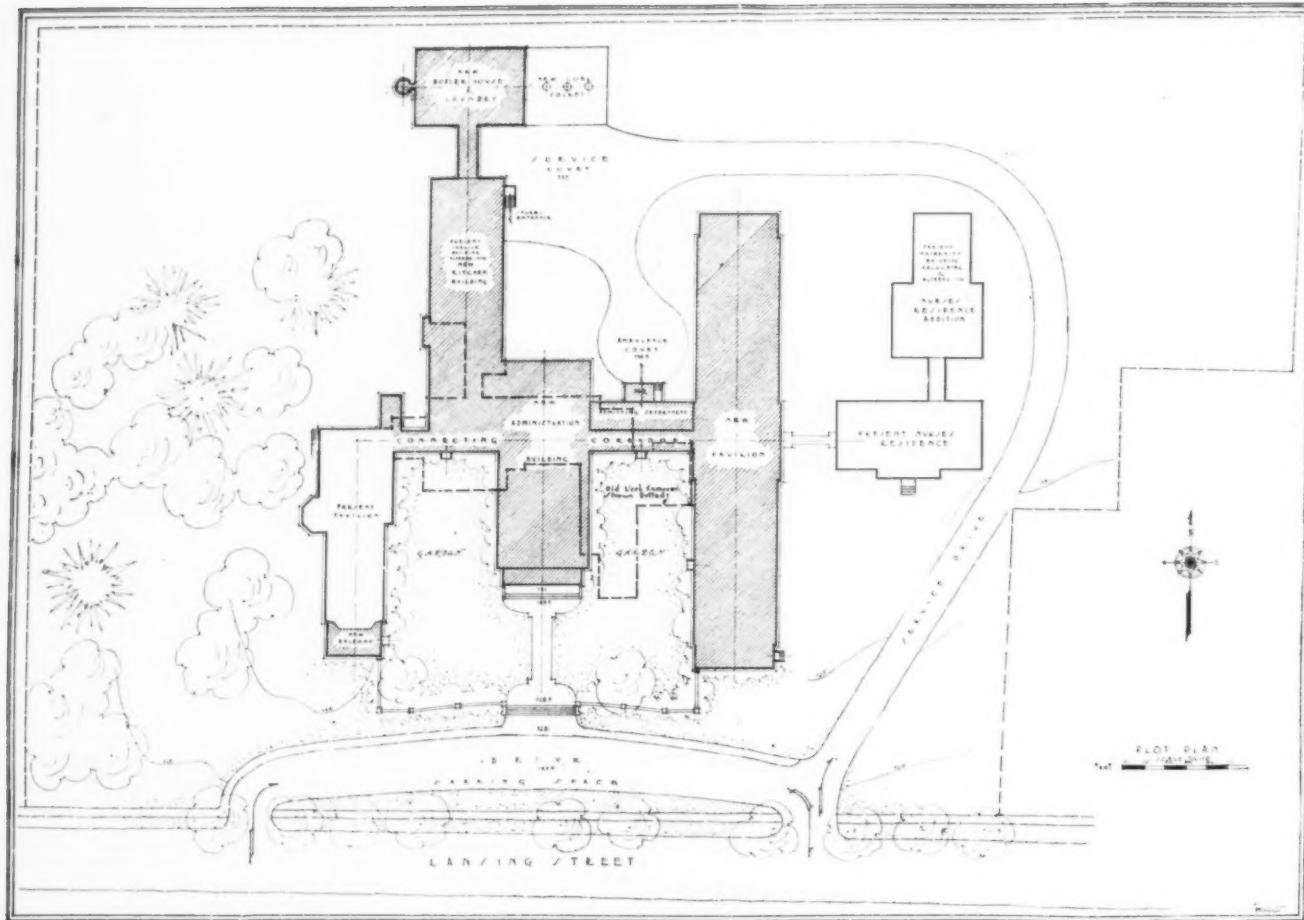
Auburn City Hospital. General plan, showing new extensions and connection to old building.
